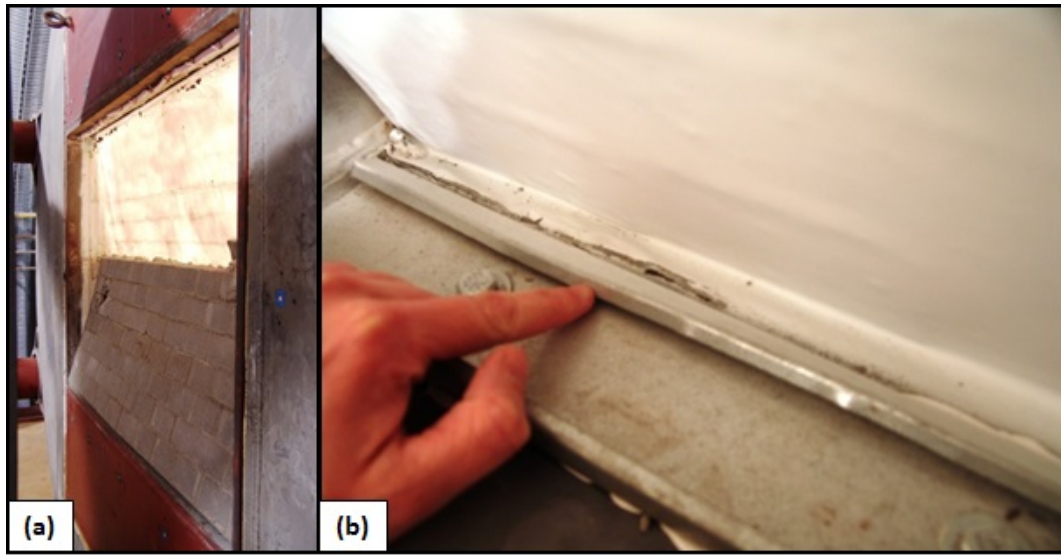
BLS5. (a) Posttest exterior face of wall after the CMU blocks on the top half of the wall fell to the floor due to gravitational forces. (b) Force of wall response bent the flanges on the steel studs.
